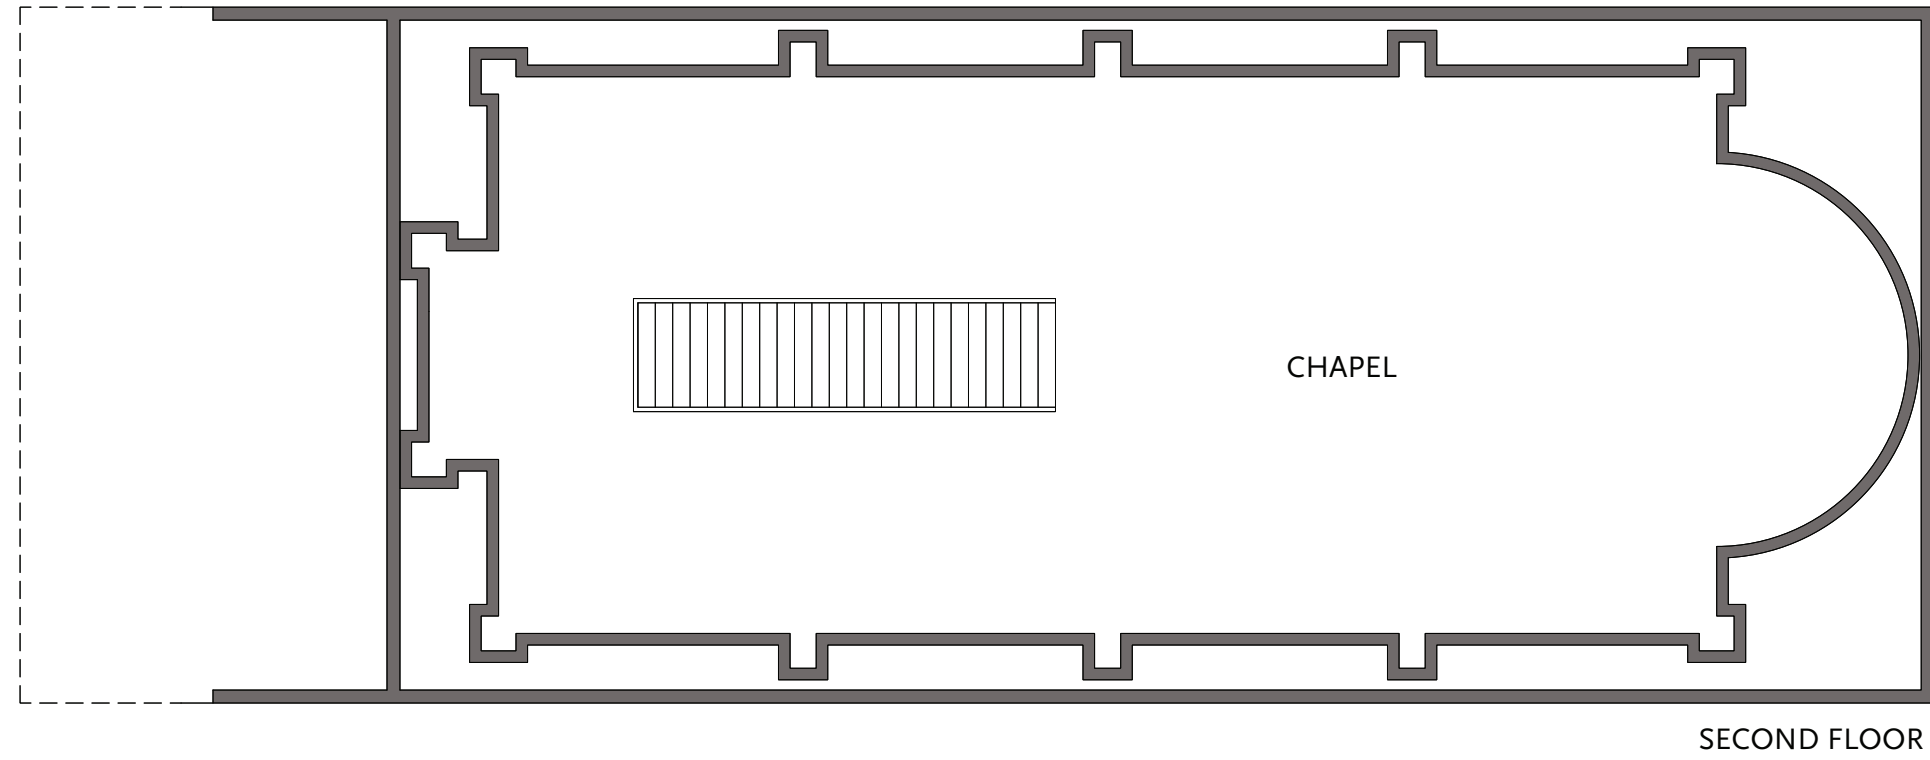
Floating Church of the Redeemer Reconstruction Plans.
